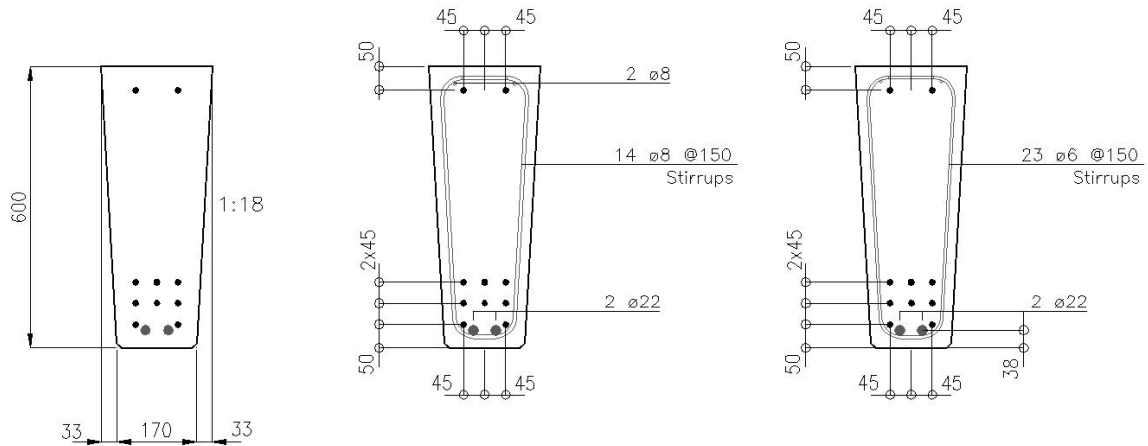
Cross section and reinforcement arrangement of the shear beams AV
